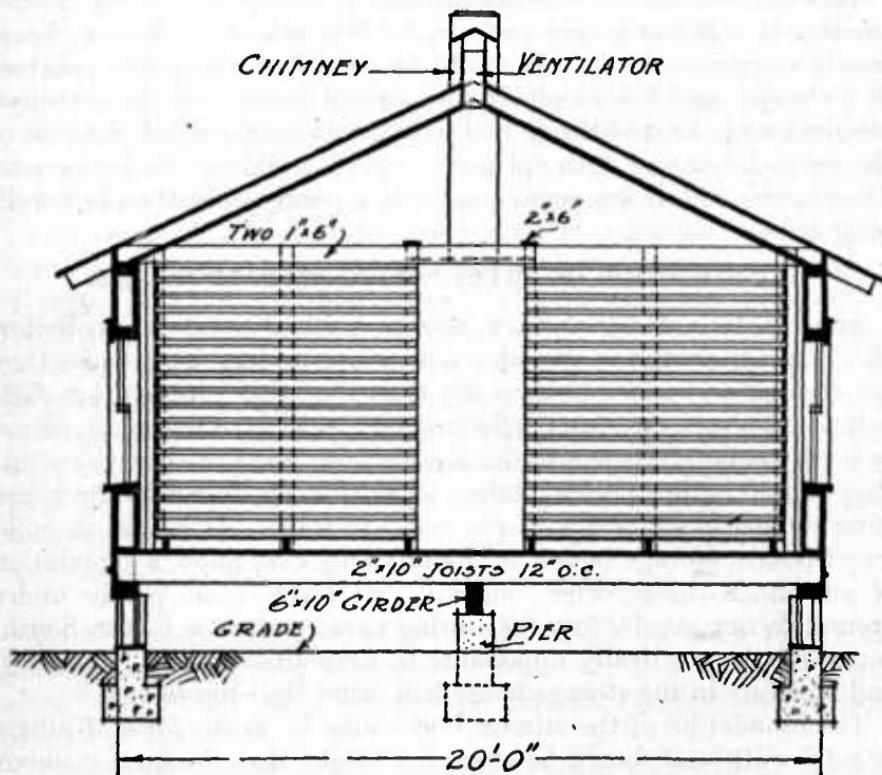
Cross section of a 20 by 40 foot sweet-potato storage house.
